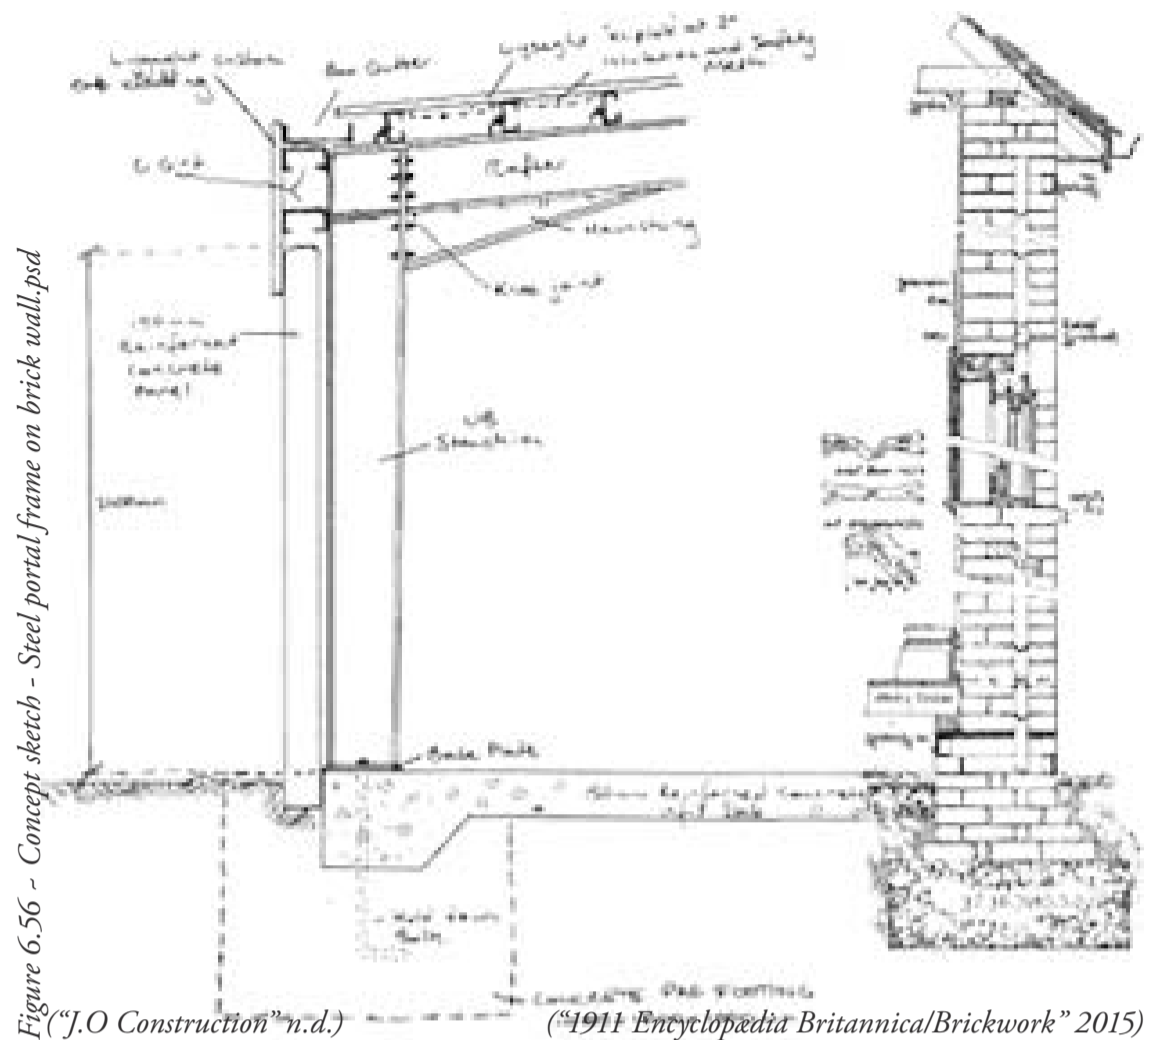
Concept sketch - Steel portal frame on brick wall.psd
